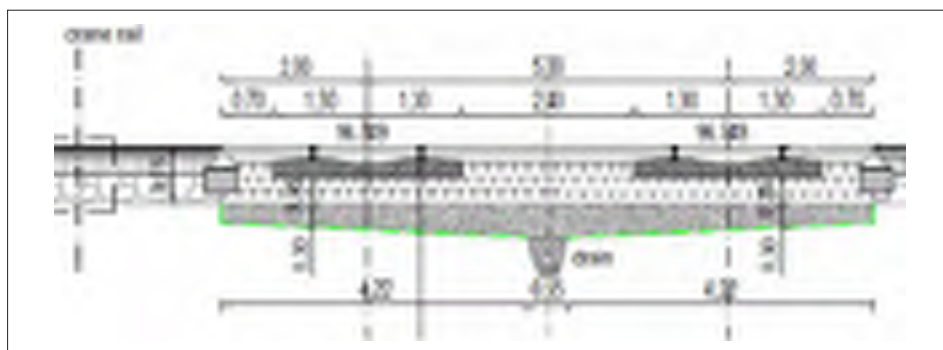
Connection surface paving and rail within the logistics par – technical solution
